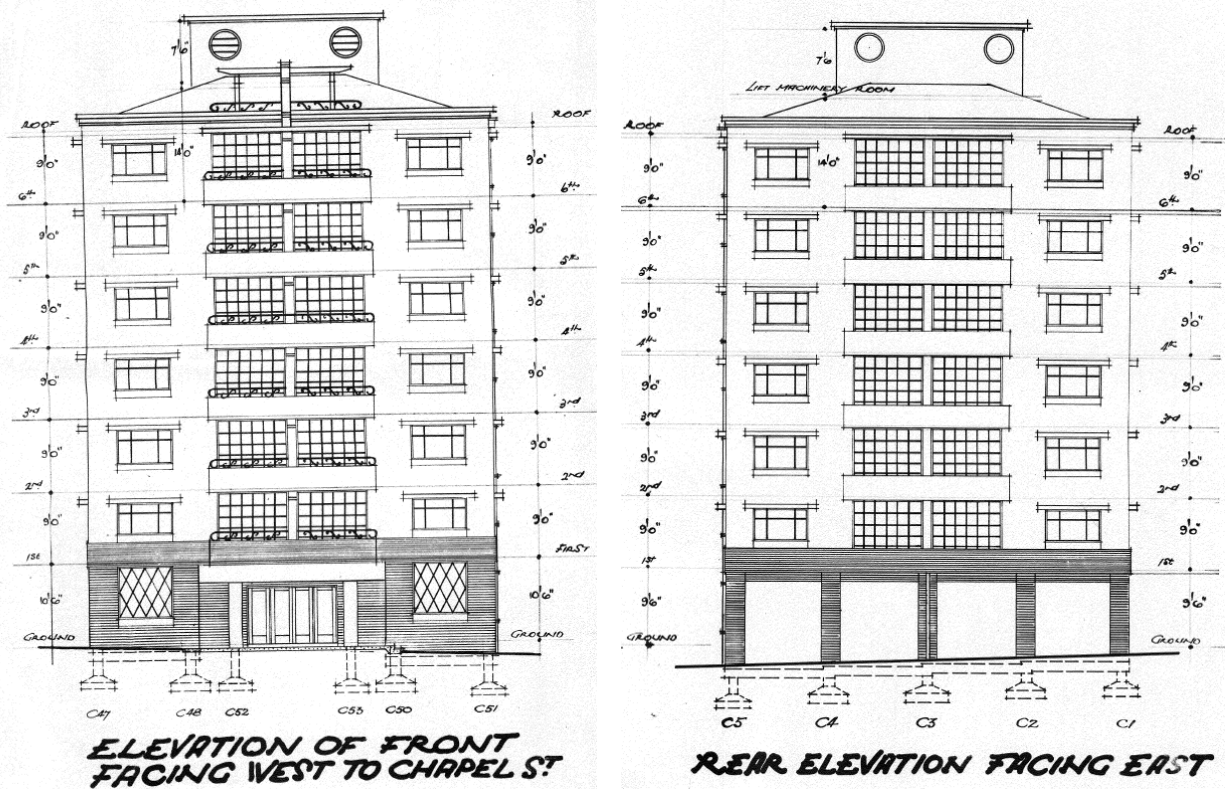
drawings for original 7 storey design – front (west) and rear (east) elevations (Source: BP, sheets 7 +8)
